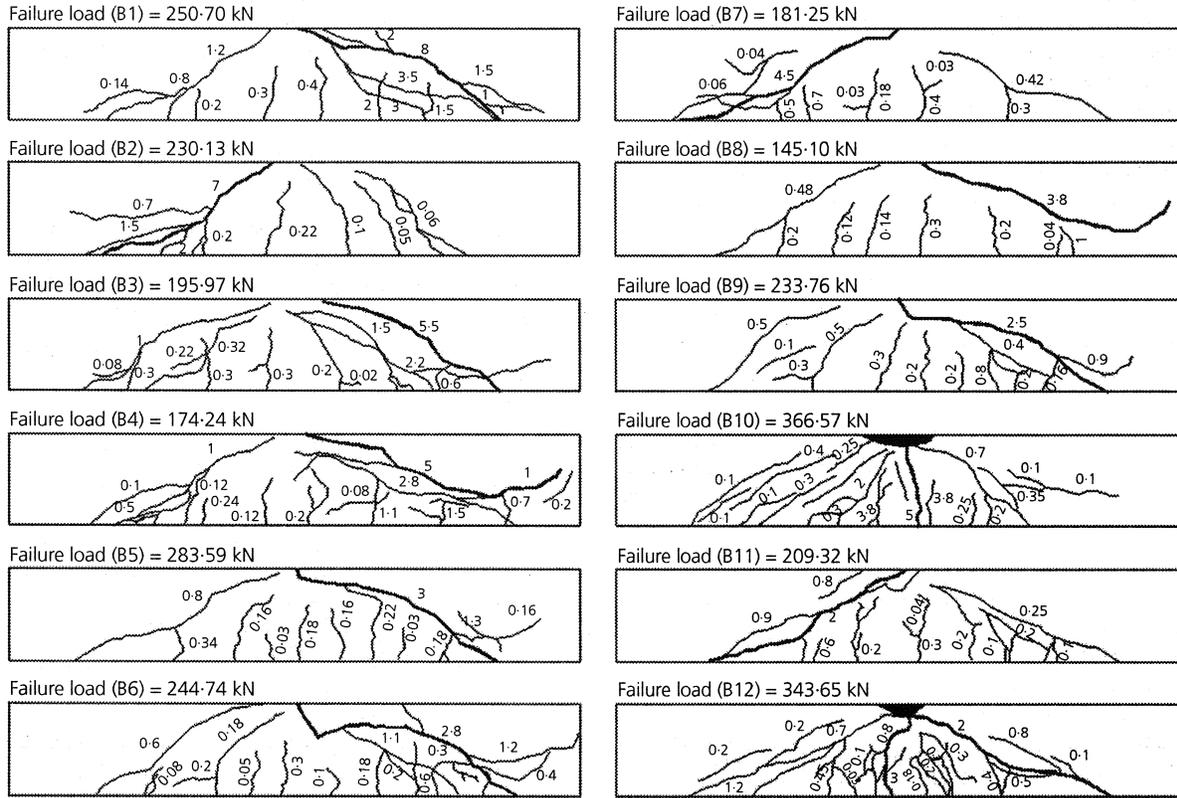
Crack patterns of tested beams at failure (crack widths in mm)
